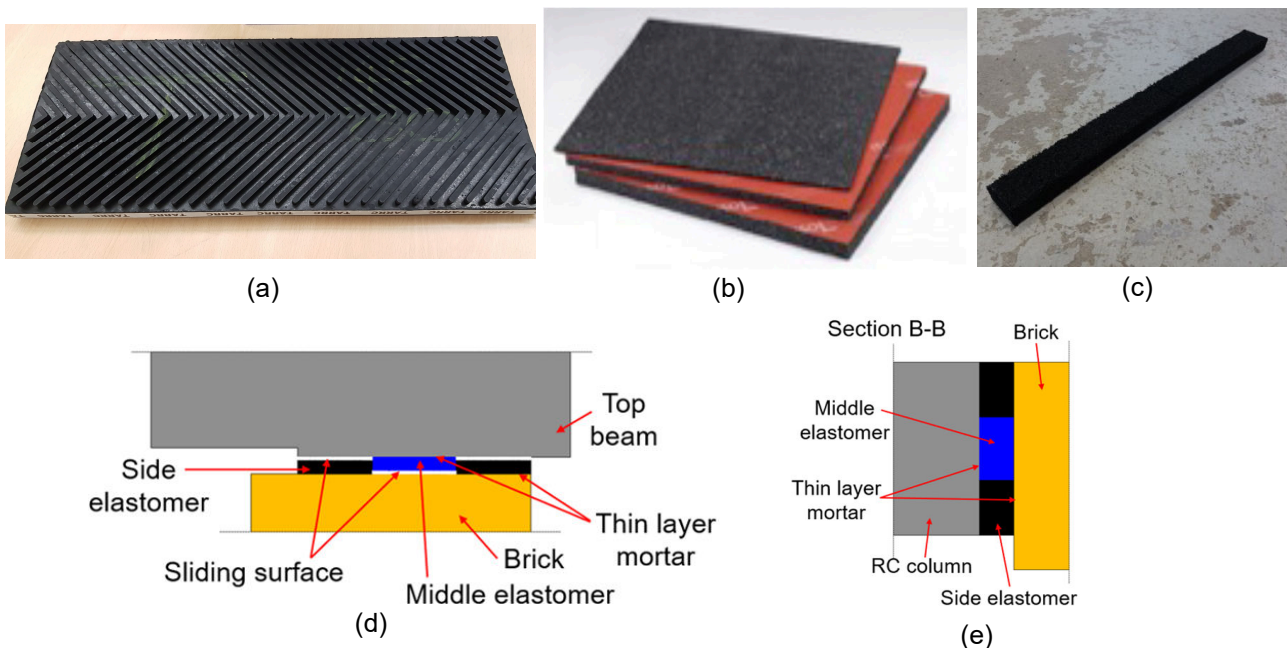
(a) Type 1T joints, (b) Type 1E joints, (c) Type 2 rubber strips, (d) and (e) Type 2 joint system.
